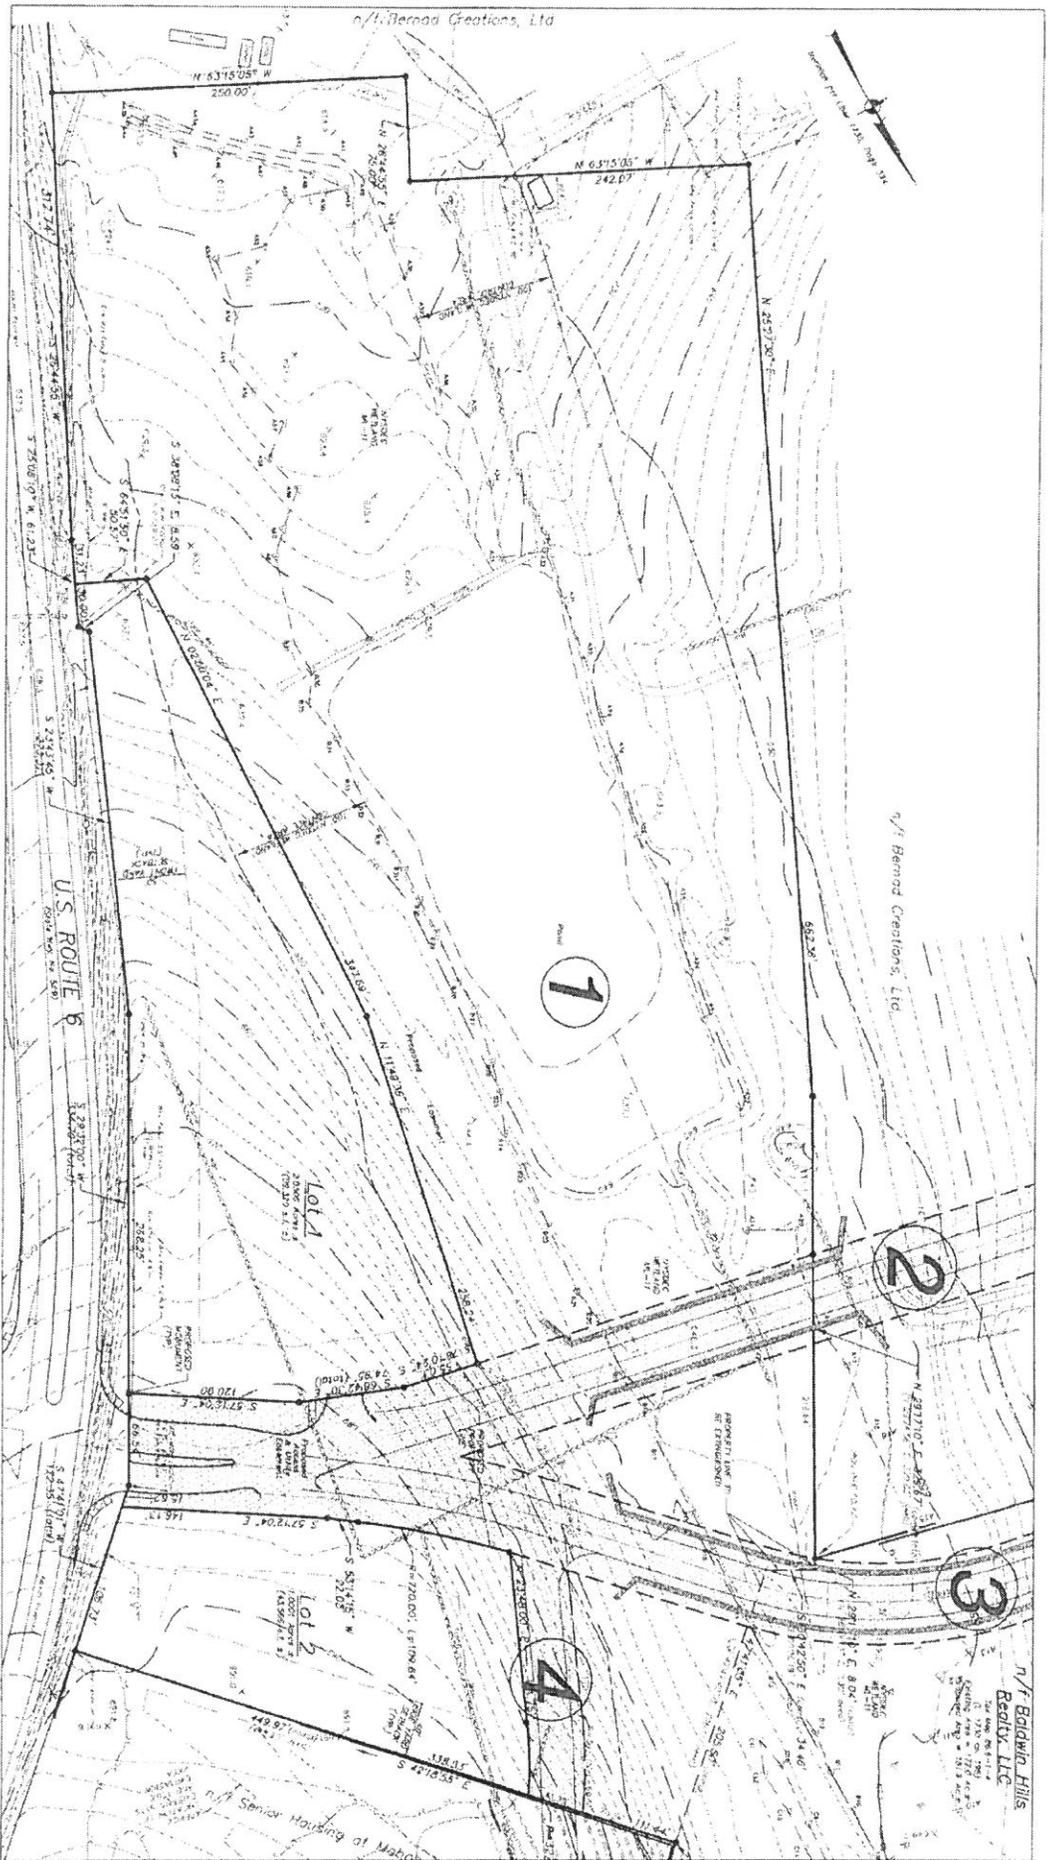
Proposed Lot Line Adjustment Driver Plan
